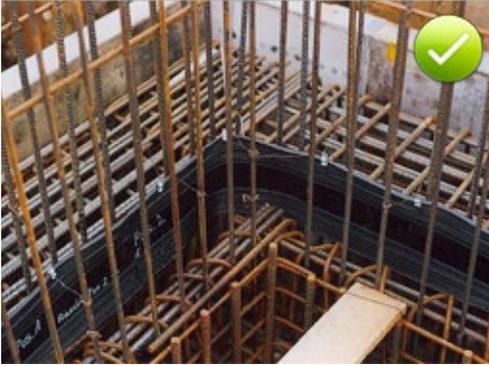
Waterbars installed in the construction joint between base slab and wall with continuous top reinforcement layer
